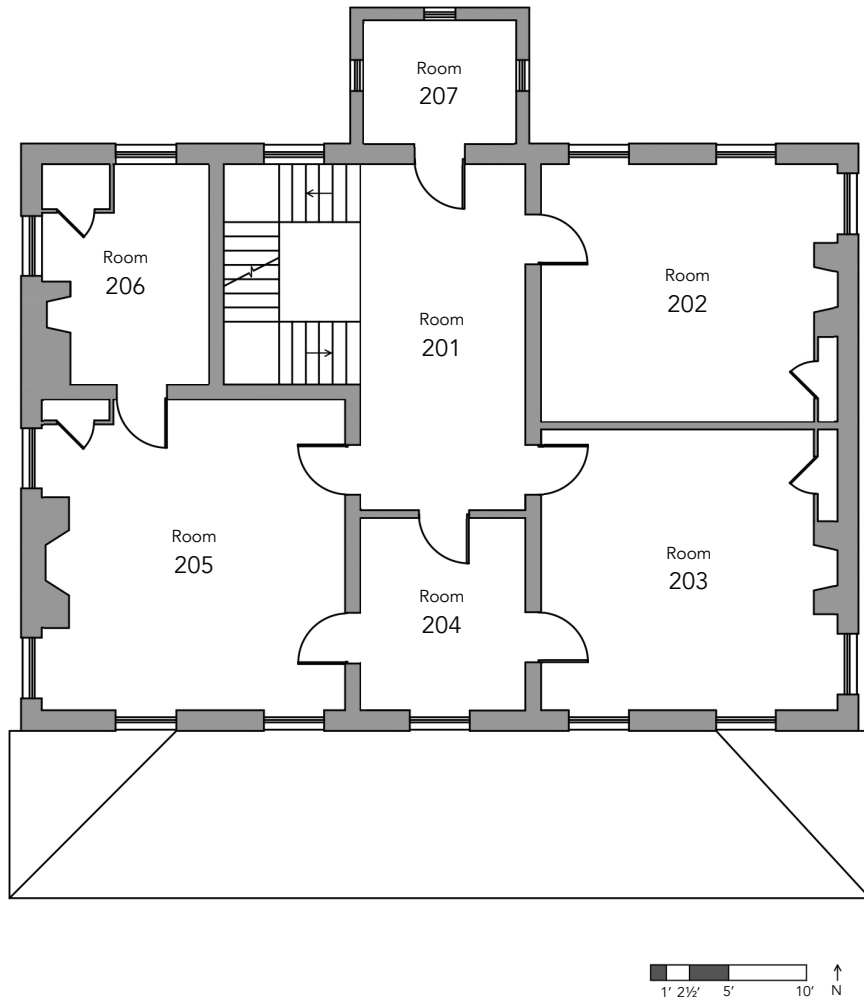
Second Floor Plan of the Kirkbride Mansion, c. 1877. Drawn by author, 2016.
